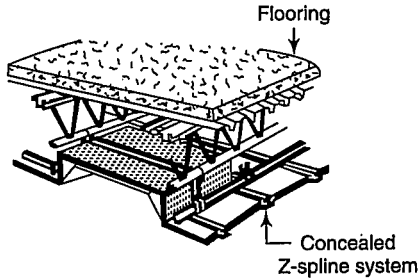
Details of suspended ceiling construction providing movement restraint (Berry 1972)
